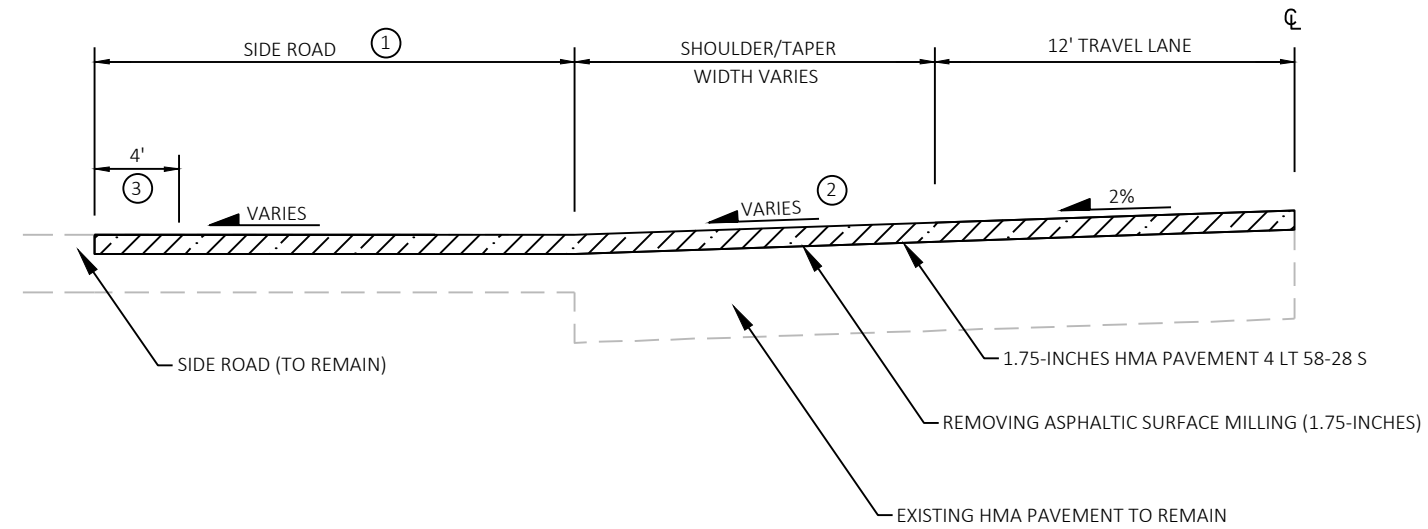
DETAIL FOR RURAL PAVED SIDE ROAD WITH AND WITHOUT CONCRETE CURB AND GUTTER
